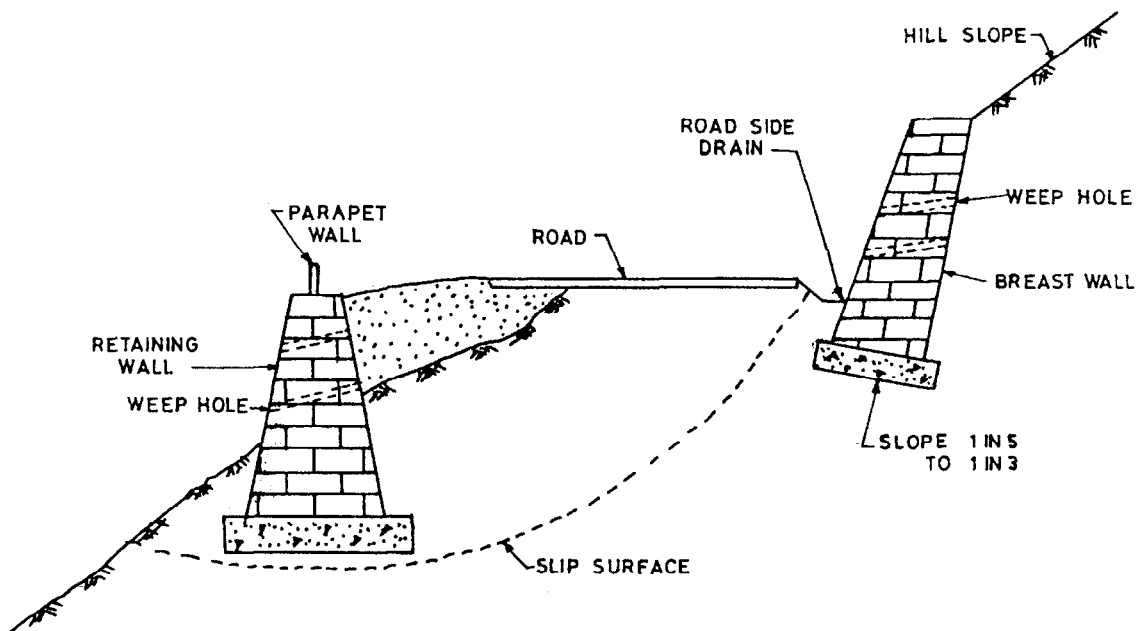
TYPICAL ARRANGEMENT OF RETAINING WALL AND BREAST WALL IN A ROAD CROSS-SECTION
